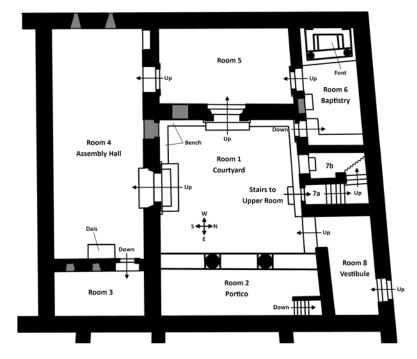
Floor plan of the Christian building at Dura Europos after renovation.
